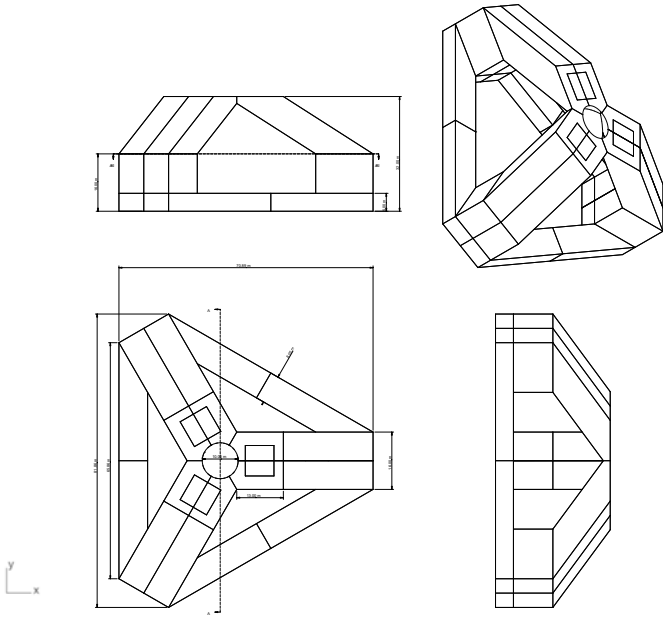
PyraWind™ Elevation, Plan, Side and Isometric Views
